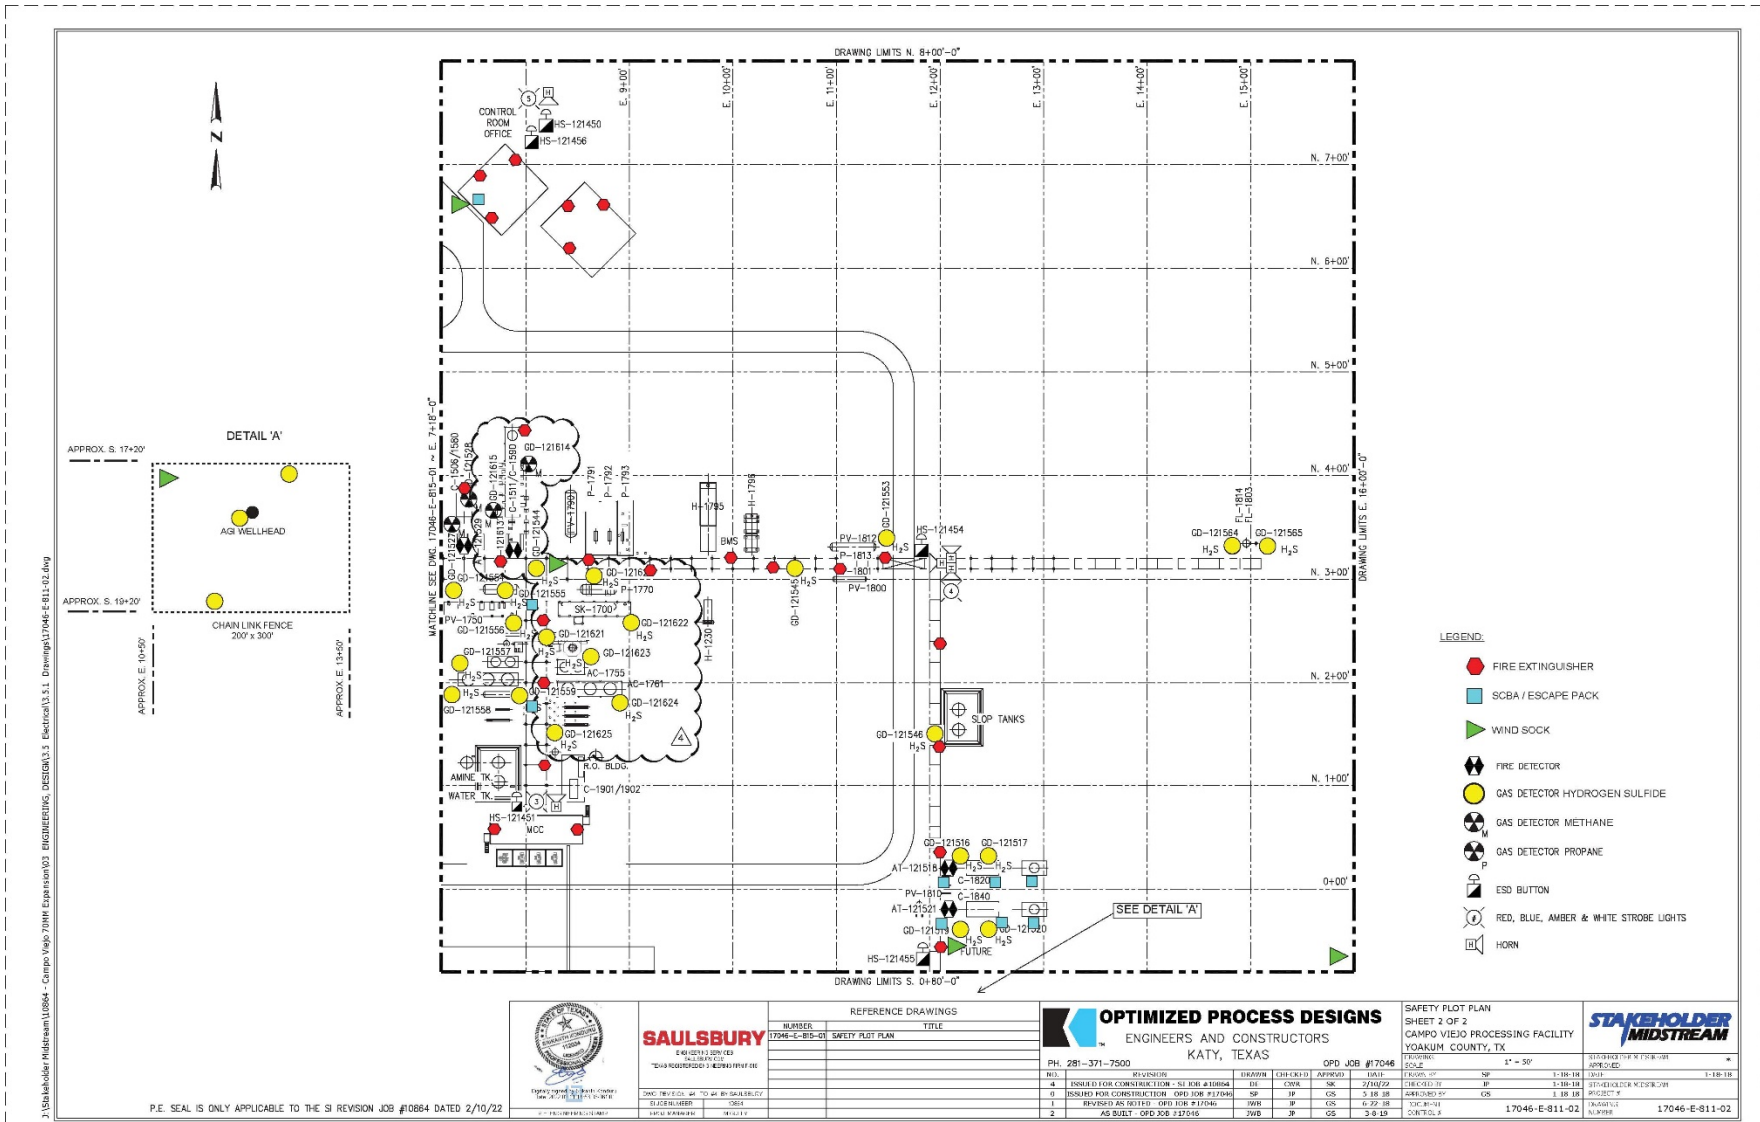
Site Plan, Campo Viejo Facility and PAV #1 – East Section
